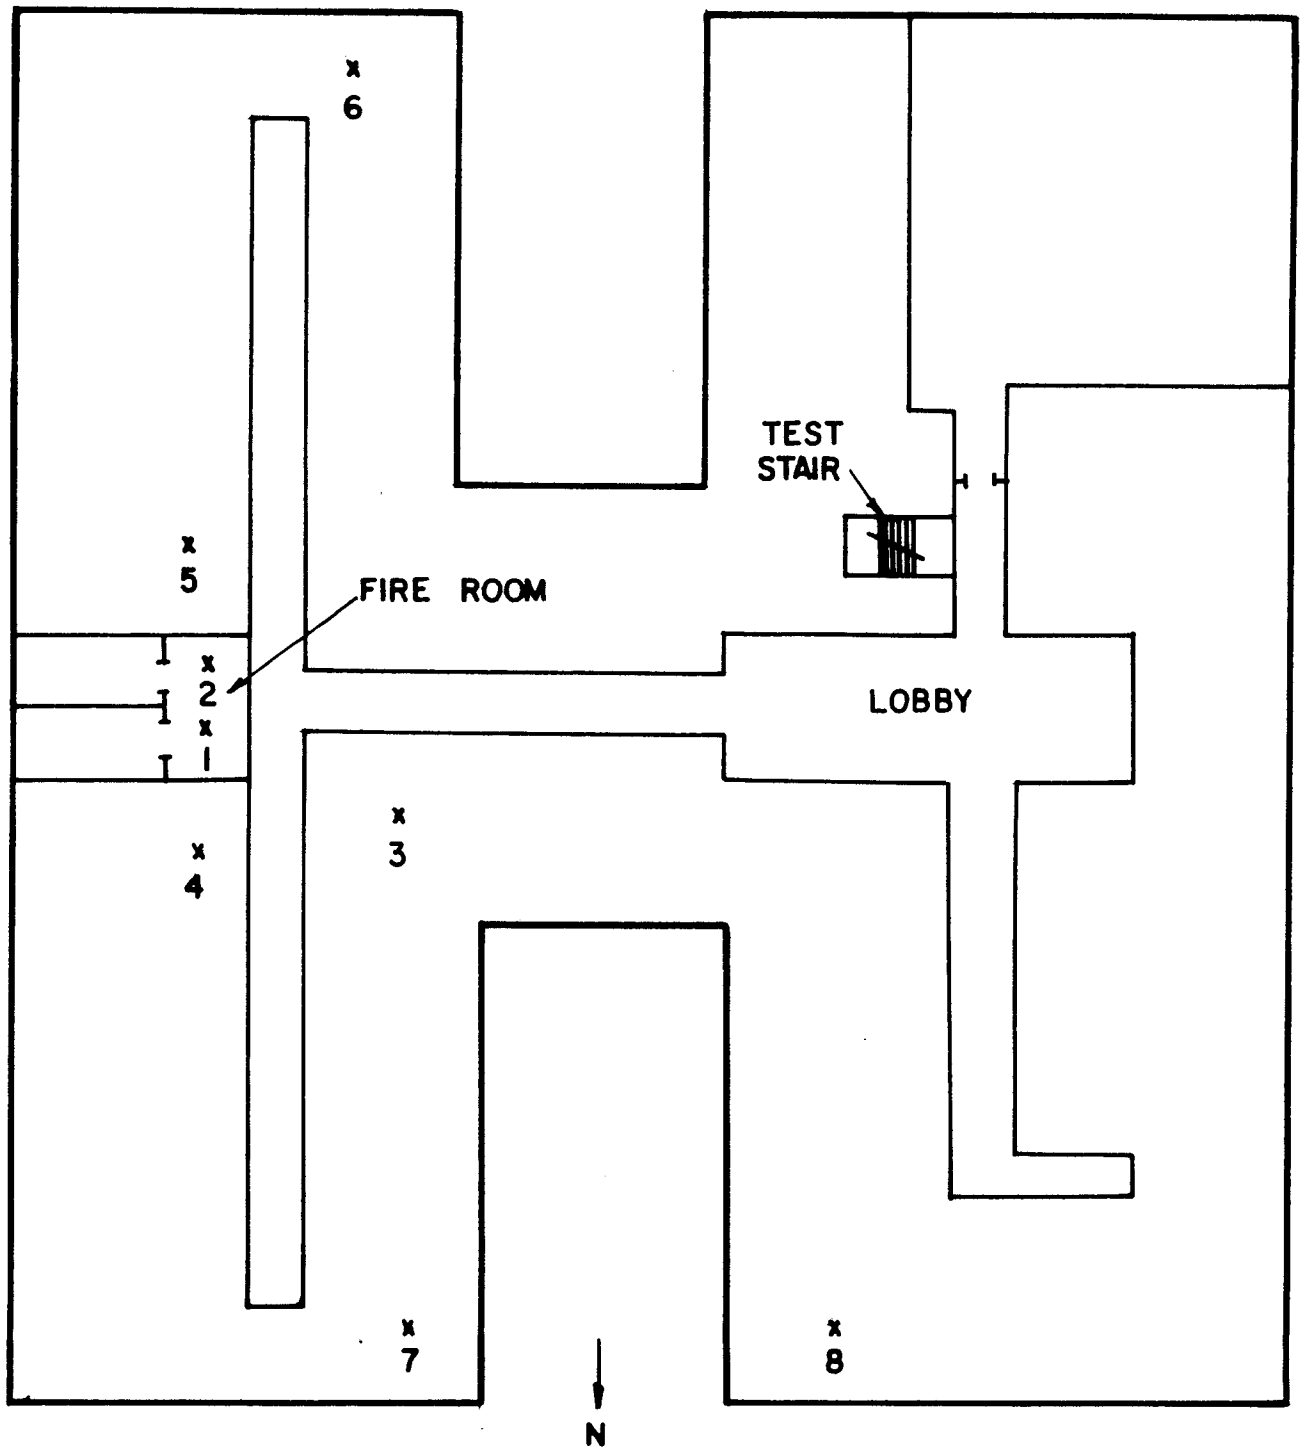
INSTRUMENTATION LAYOUT ON 10th FLOOR -
